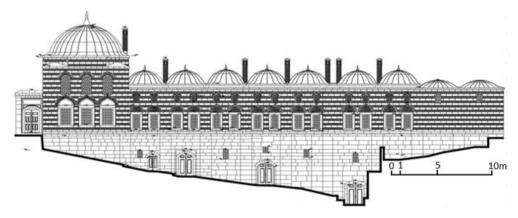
North Facade Restitution by Architecture Foundation, 2010 (archive of DGF)
